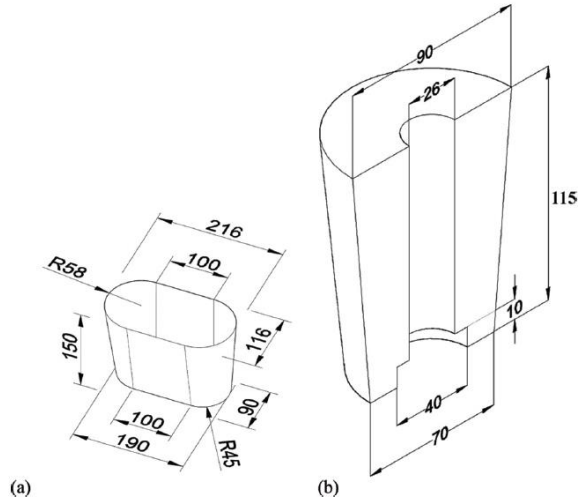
Dimensions of (a) slab pocket and (b) half plug [31].
